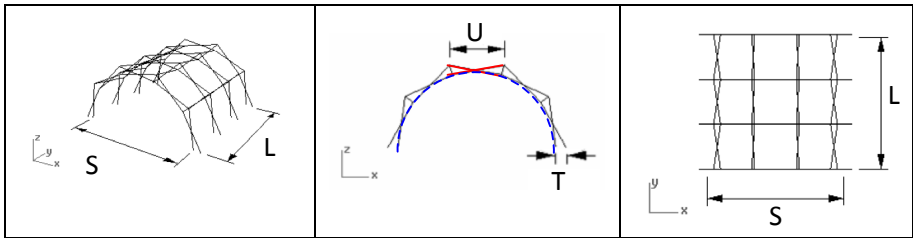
Perspective, section and plan view of a polar barrel vault
